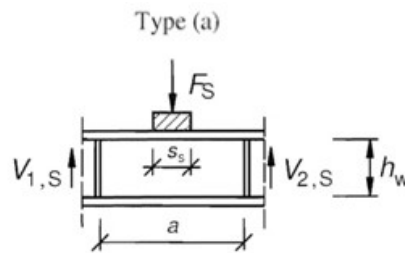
Load type a for an unstiffened I-girder [1, p. 26]
